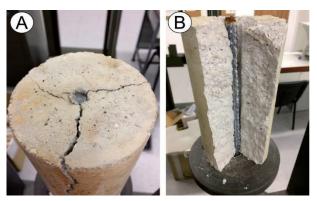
An example of failure while testing the adhesion strength of a CA-00 concrete sample: A – top surface; B – side surface
